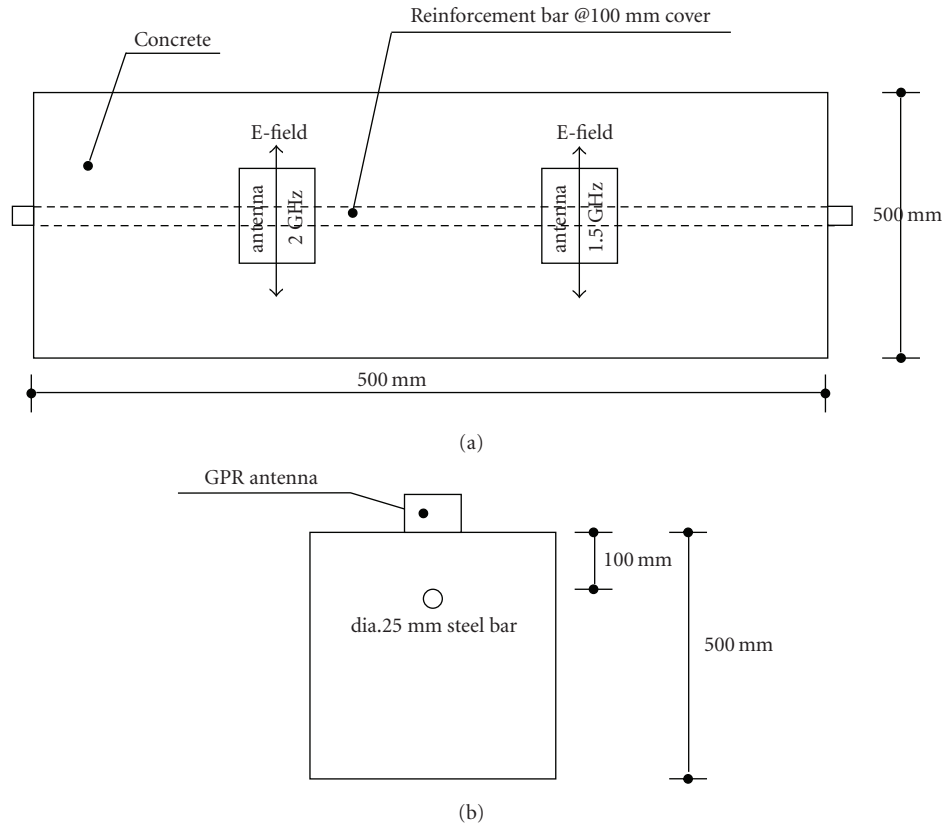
Plan view (a) and section (b) of the concrete specimen.
